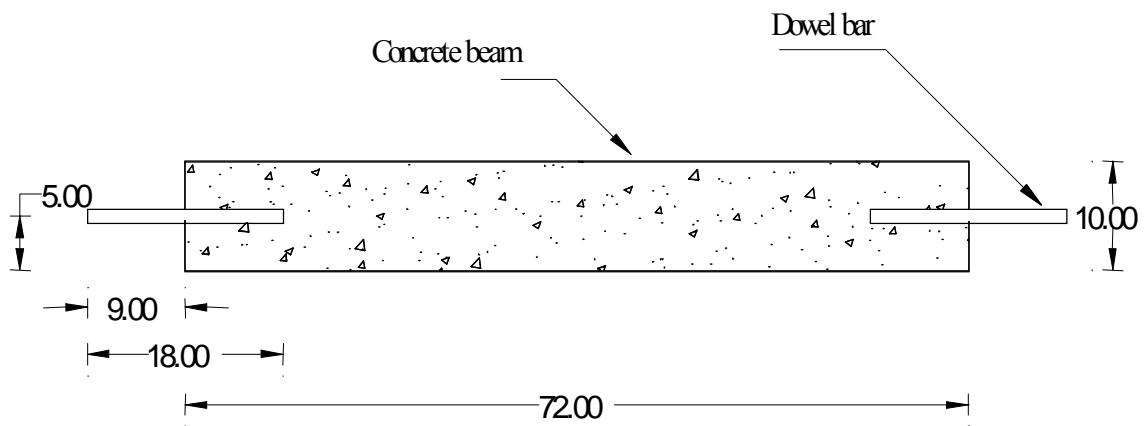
Schematic drawing for test rig mounted with full joint specimen
